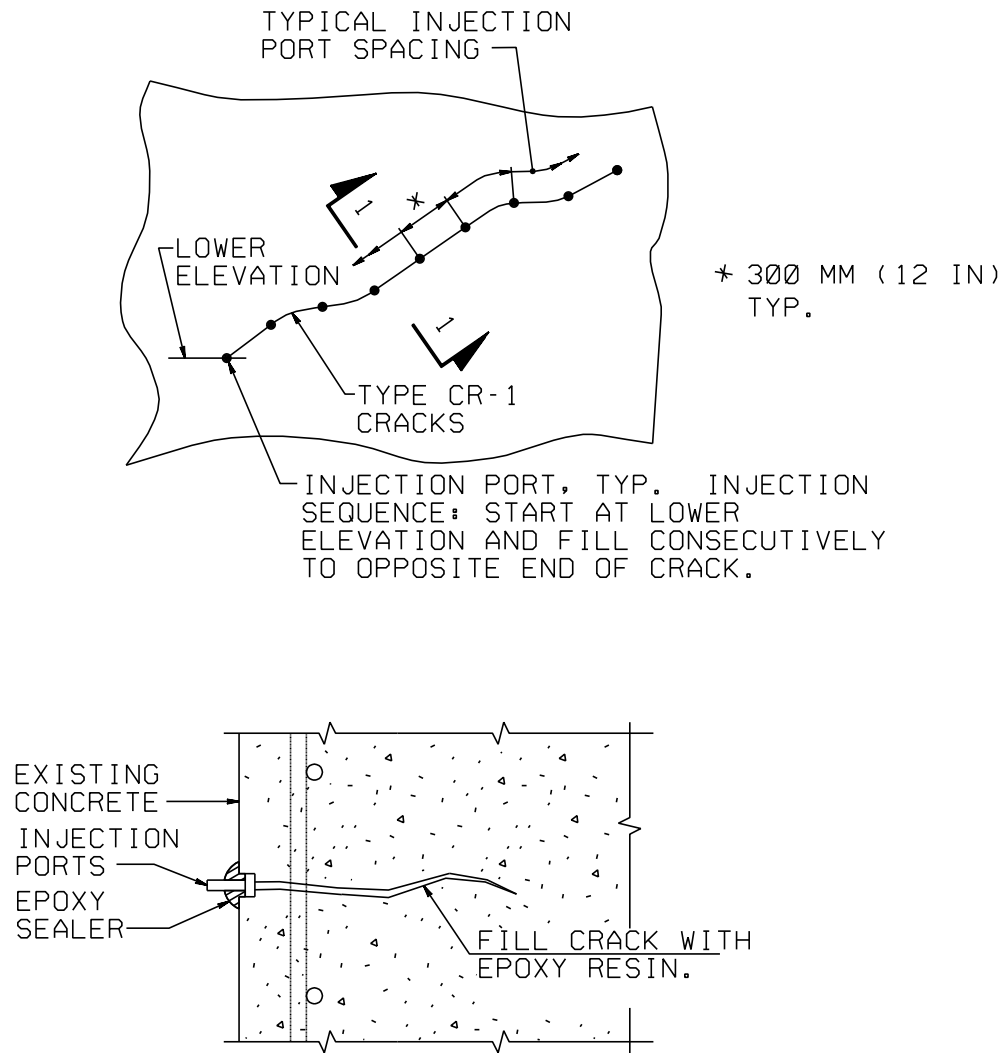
Section 1-1 – Vertical/Over Head Crack Repair Detail (FHWA, 2005)
